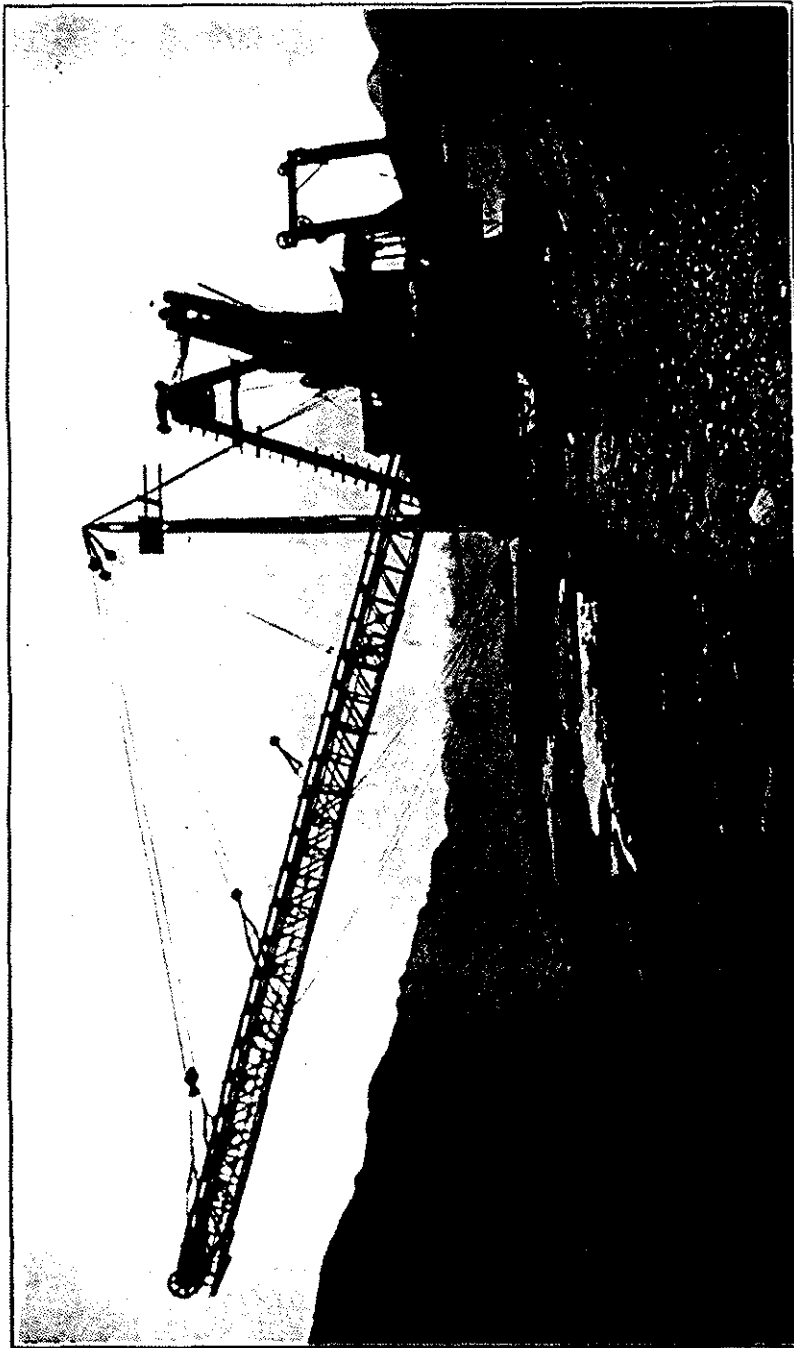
Steam-shovel with belt-conveyor spoil-elevator.
